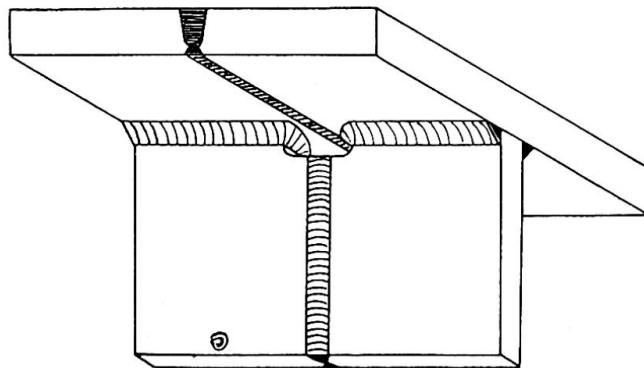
gives an idea of the construction and design for riveting and welding of the corner of a joist. No further explanation of this example is necessary, as it explains itself, especially the simplicity of the welded construction.
